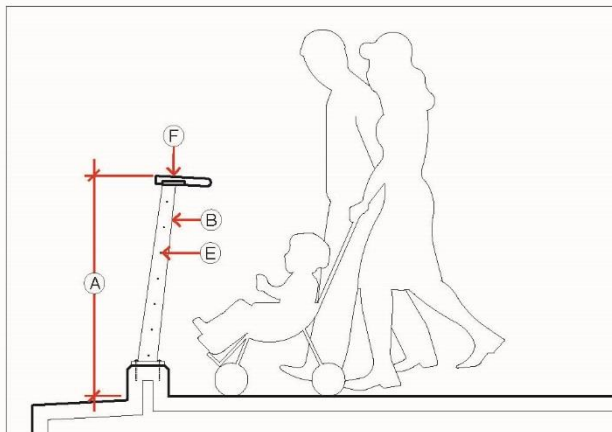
Pedestrian railing type 3 typical section
